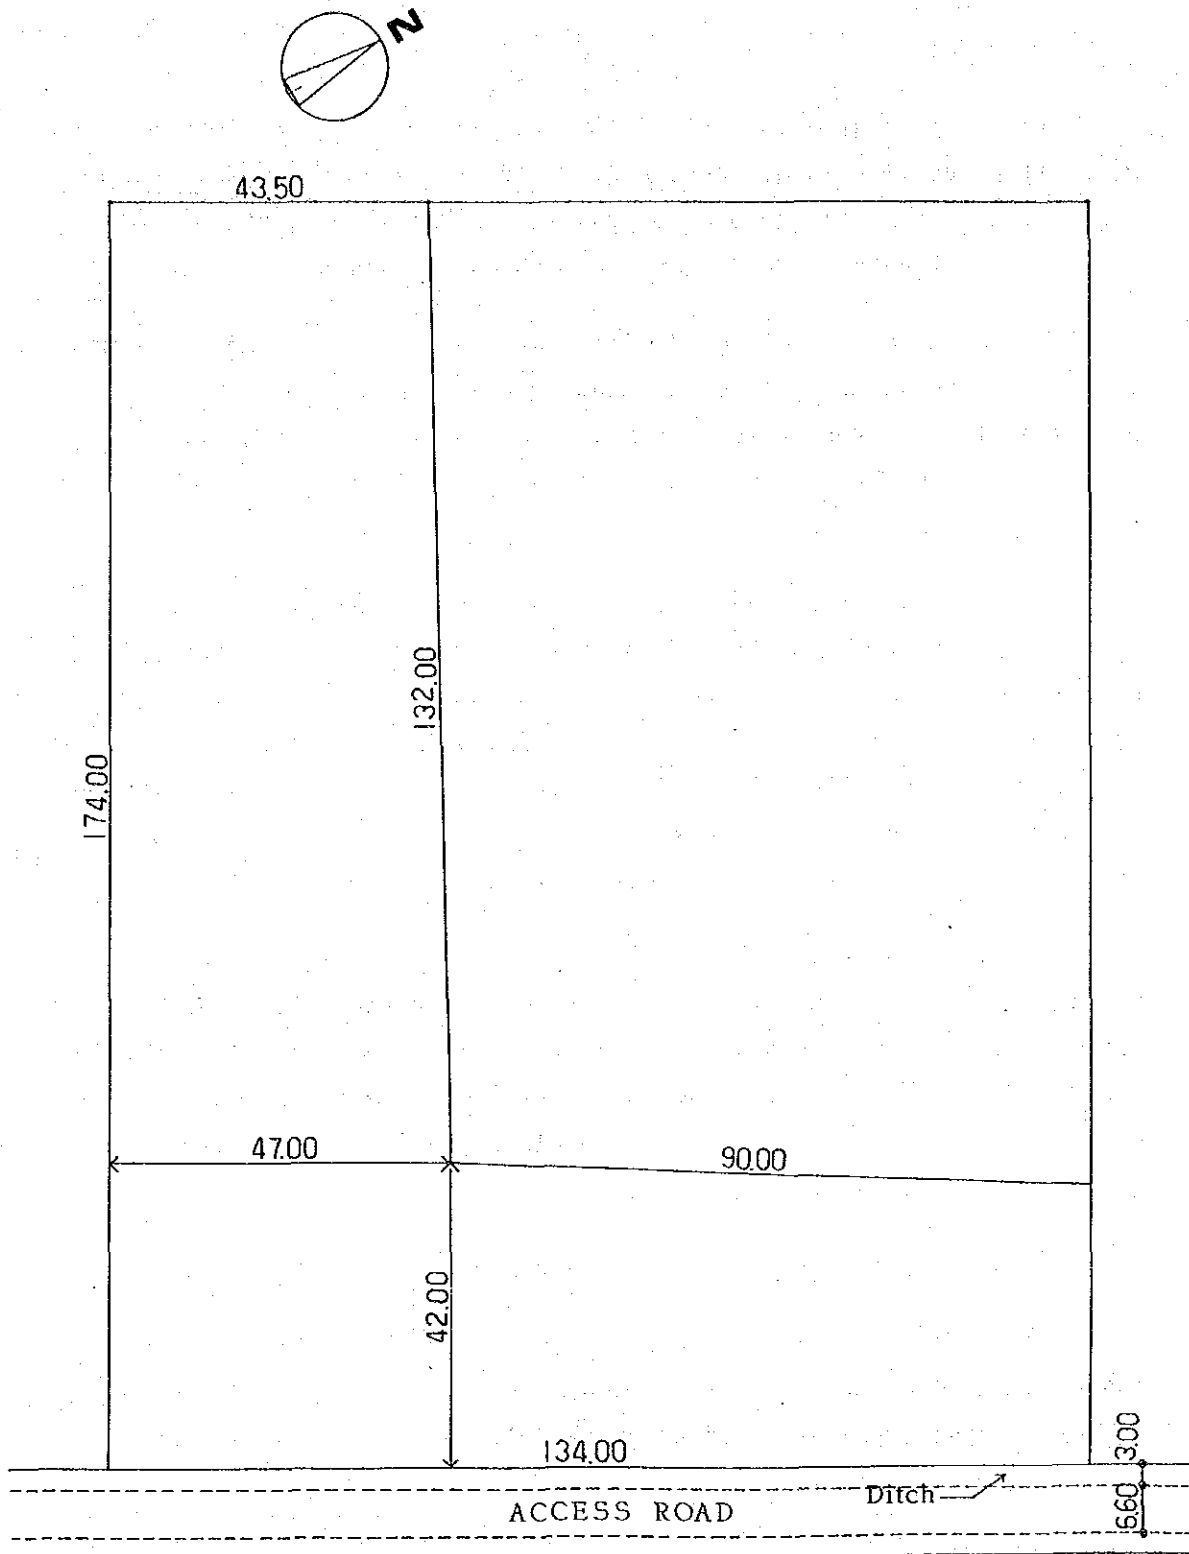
RAJAPUR PROPOSED SITE scale 1 : 1000
